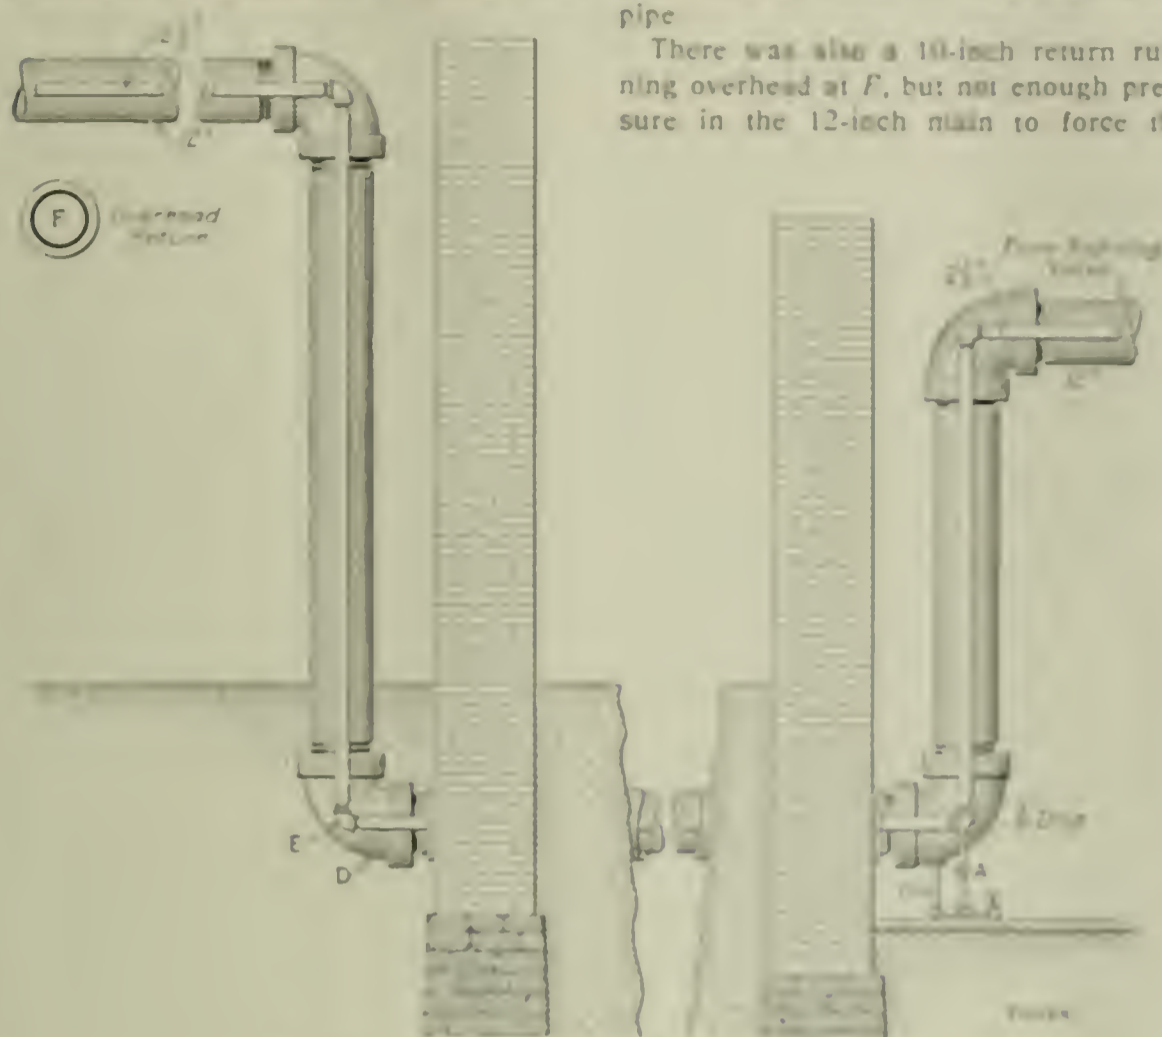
ORIGINAL ARRANGEMENT OF PIPING.
